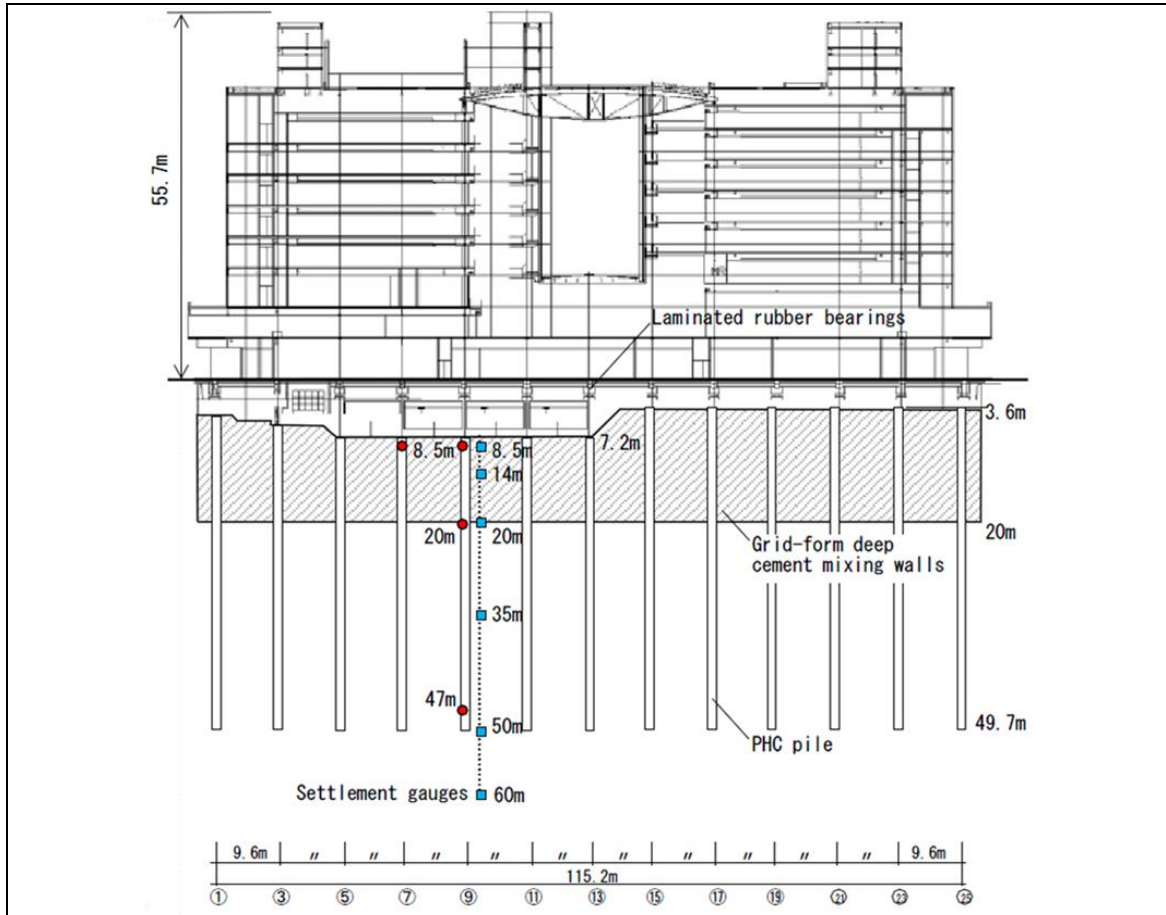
Schematic view of the building and foundation (Yamashita et al., 2013)
